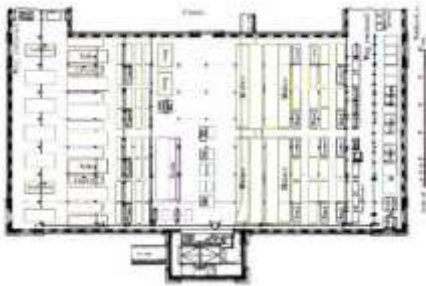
Partial plan of Izmit woolen weaving factory [2]
